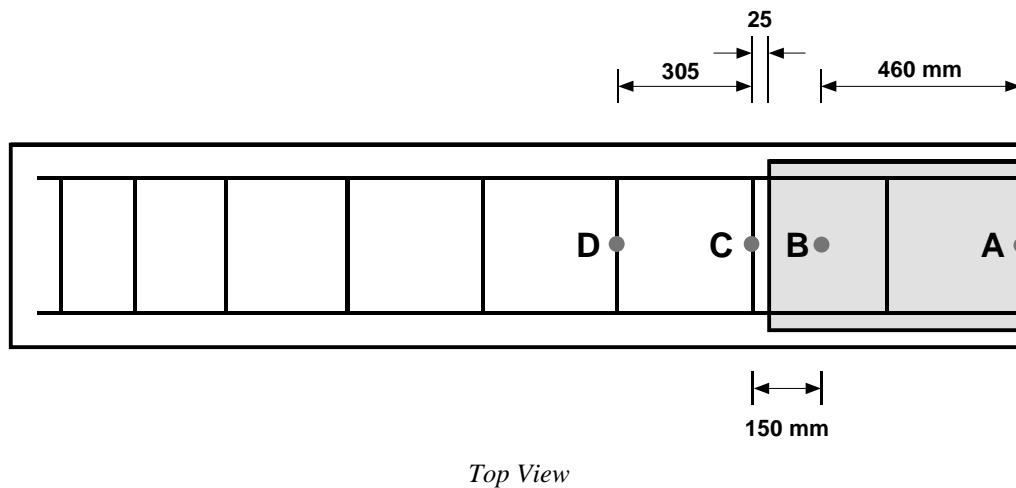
Reinforcing Bar Condition under Crack, Specimen 3.4
